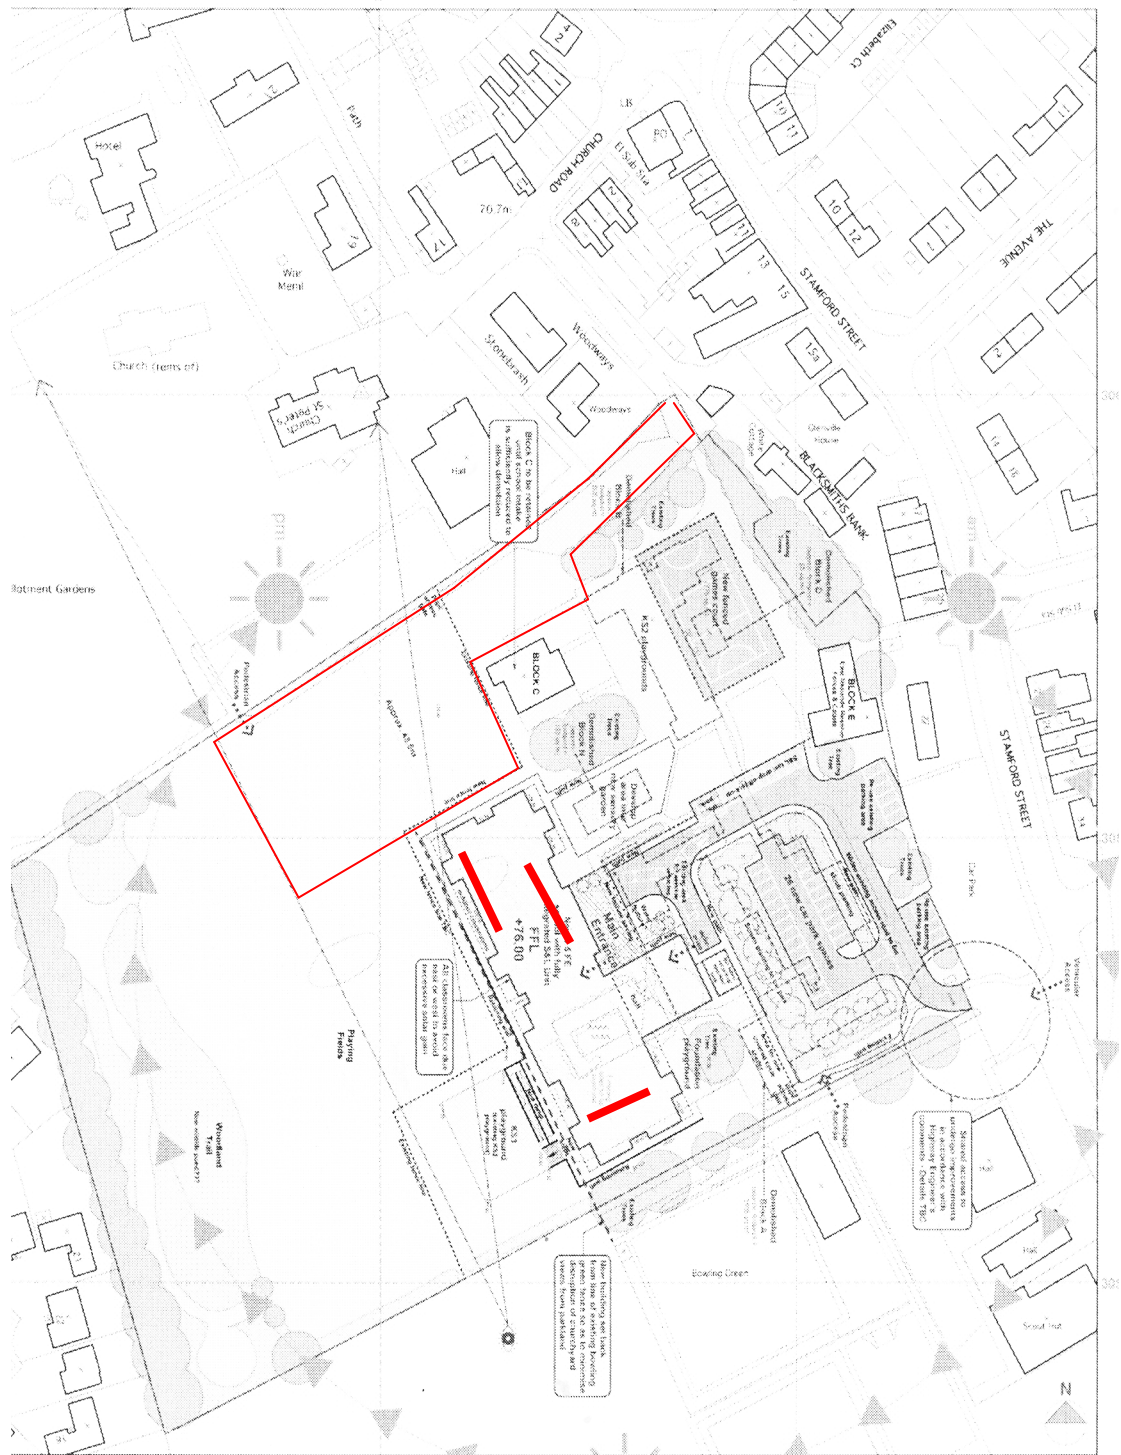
Plan of the area of new building with suggested trench locations. Area of compound to be stripped under archaeological supervision outlined.
